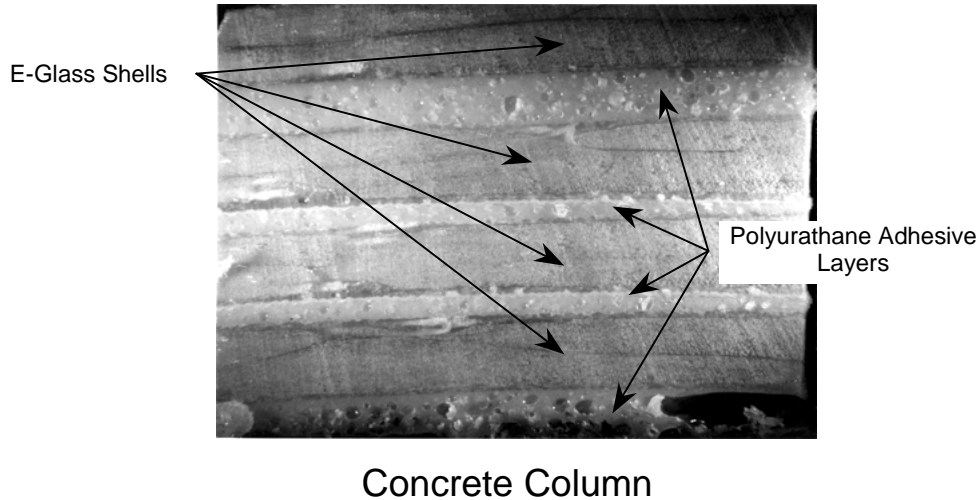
Cross-section of E-glass/epoxy sleeves bonded into a complete assembly.
